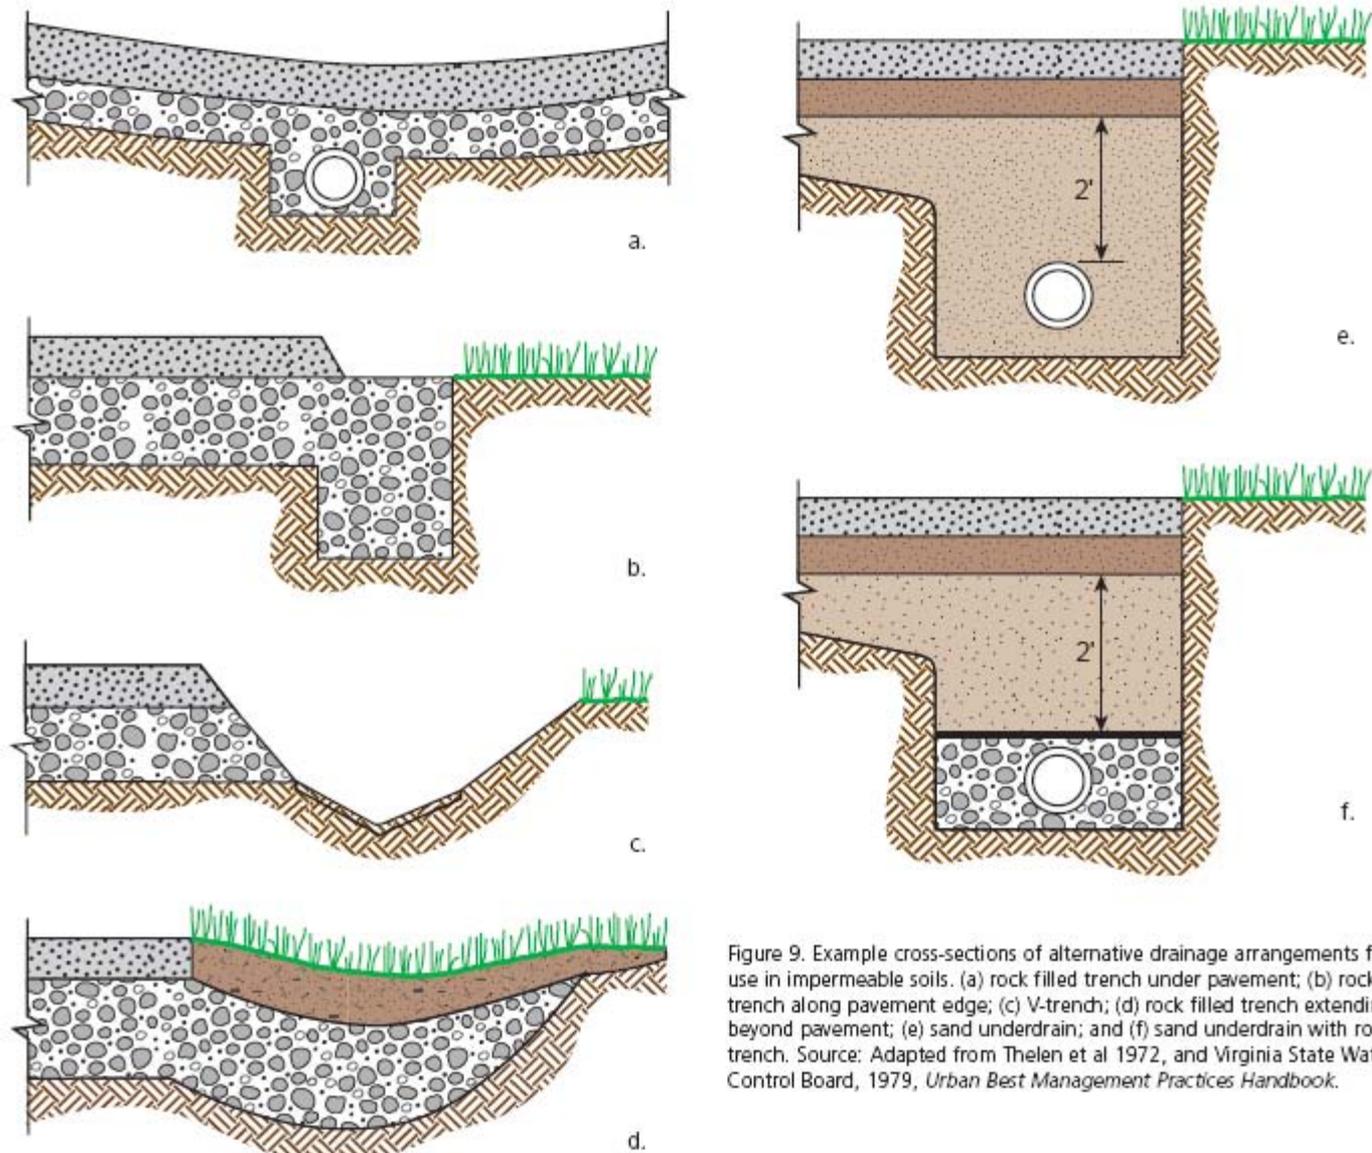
Example cross-sections of alternative drainage arrangements for use in impermeable soils. (a) rock filled trench under pavement; (b) rock trench along pavement edge; (c) V-trench; (d) rock filled trench extending beyond pavement; (e) sand underdrain; and (f) sand underdrain with rock trench. Source: Adapted from Thelen et al 1972, and Virginia State Water Control Board, 1979, *Urban Best Management Practices Handbook*.
